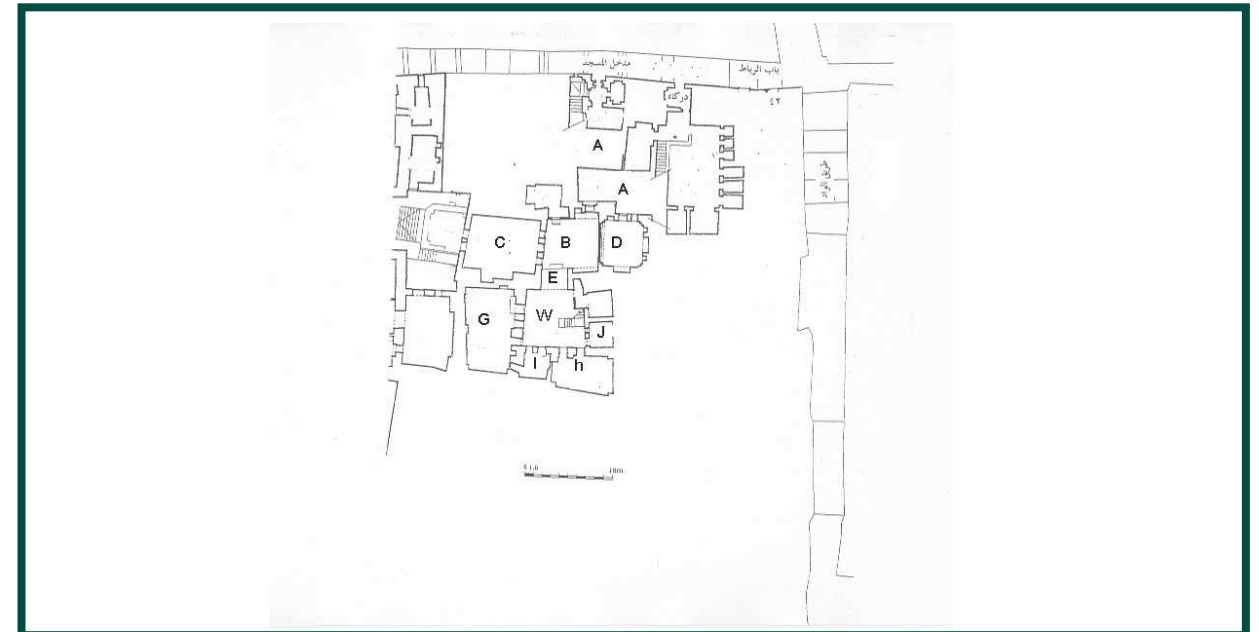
Plan of first floor of al-Madrasa al-Mawardiyya
